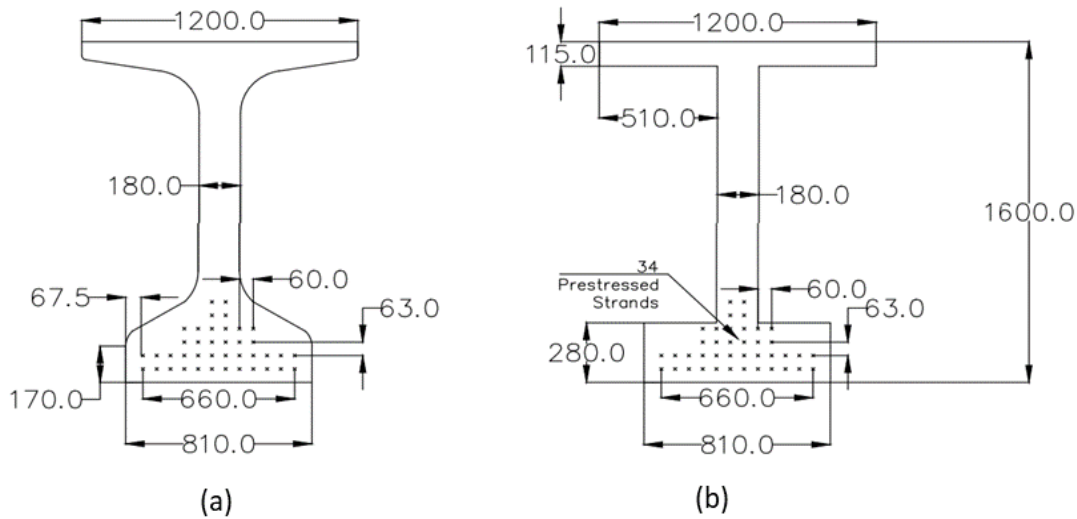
Girder cross-sectional geometry in mm: (a) standard NEBT 1600 girder, and (b) idealized NEBT 1600 girder.
